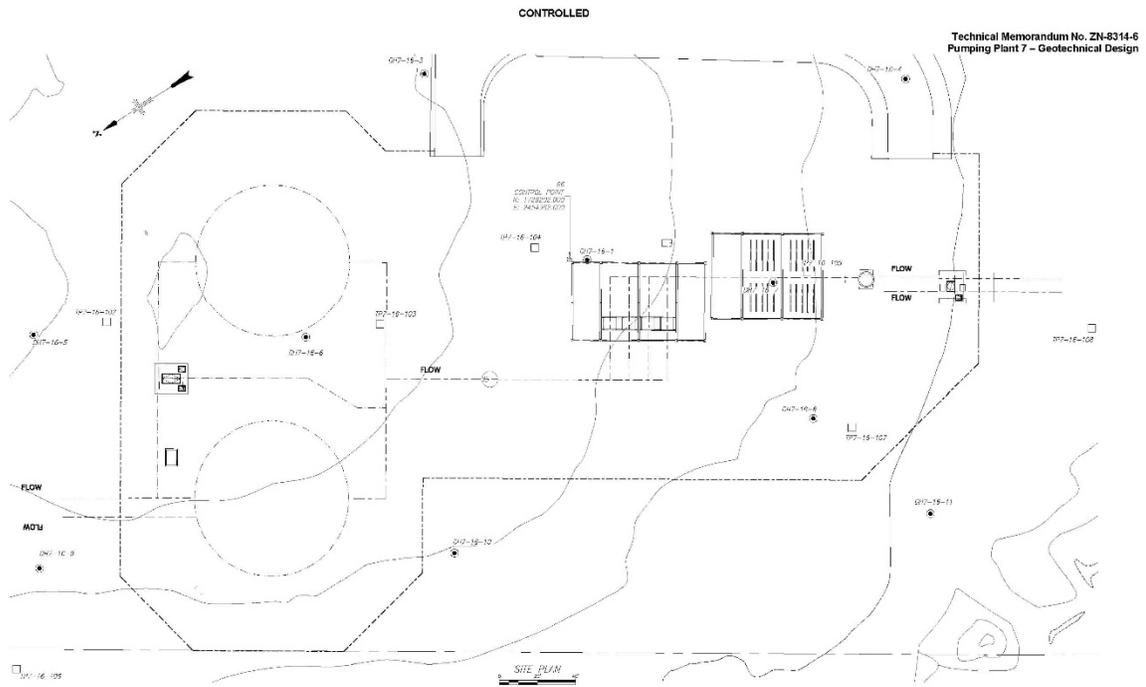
Plan view showing drillhole and test pit locations (final surface shown)
